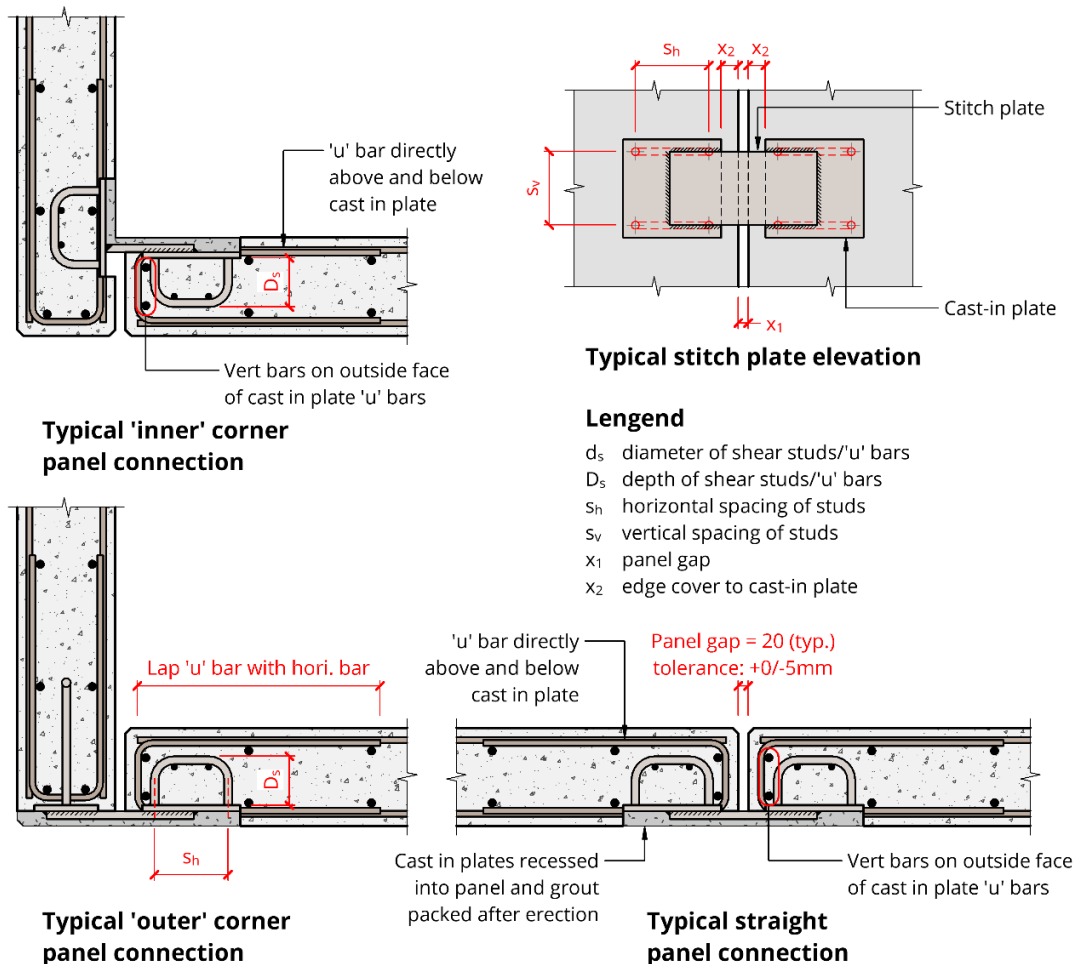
Welded stitch plate good detailing and critical dimensions.
